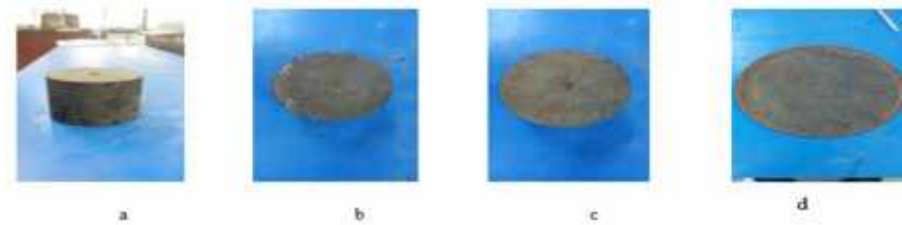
Footing geometry (a) Circular steel footing (b) Smooth base footing, (c) groove at top to apply point load to the footing, (d) Base plate
